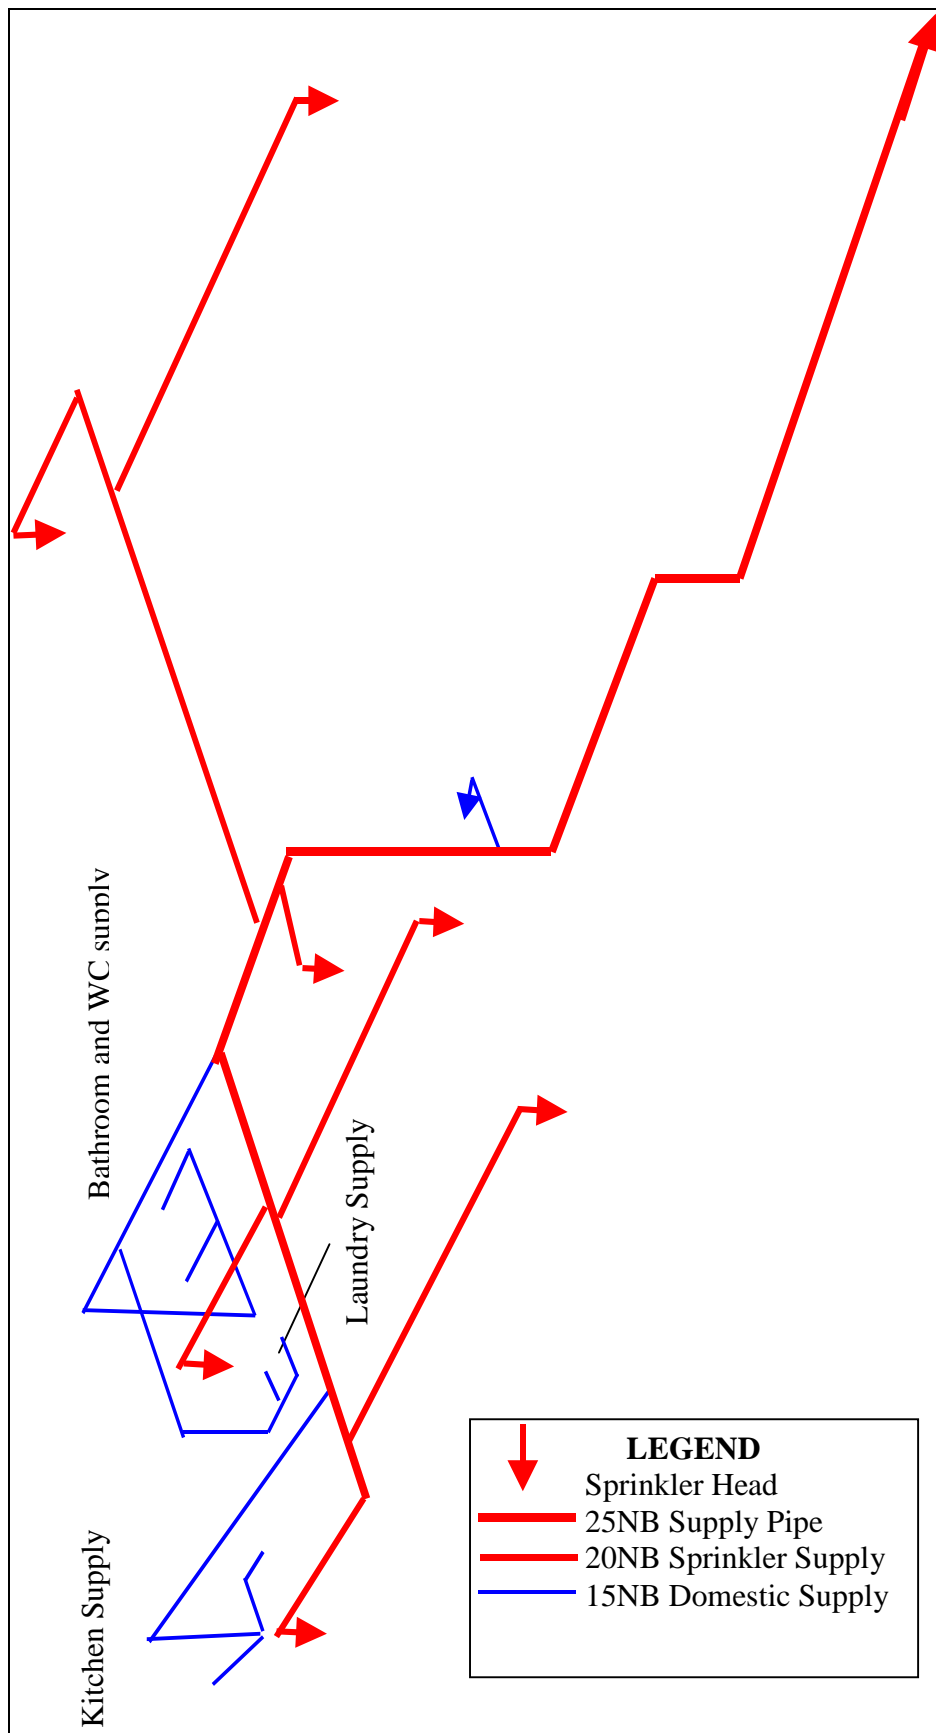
Pipe Layout of Multi-purpose Sprinkler System
